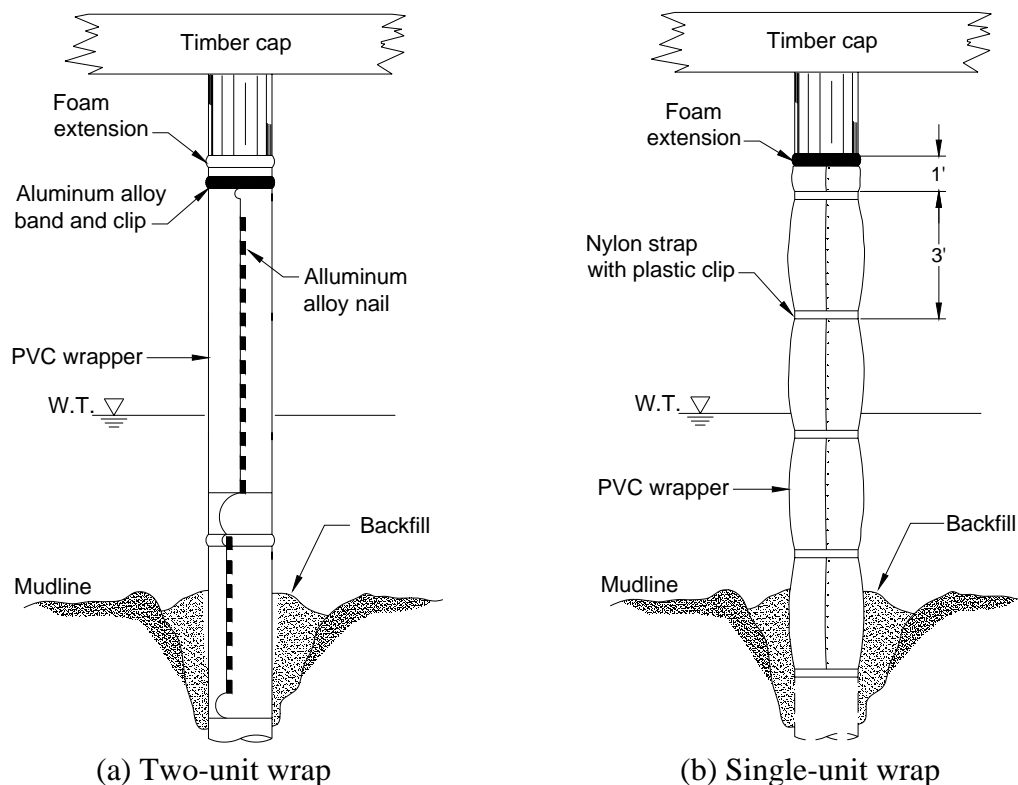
Wrapping timber piles with polyvinyl chloride (U.S. Army Corps. Of Engineers et al. 2001)
